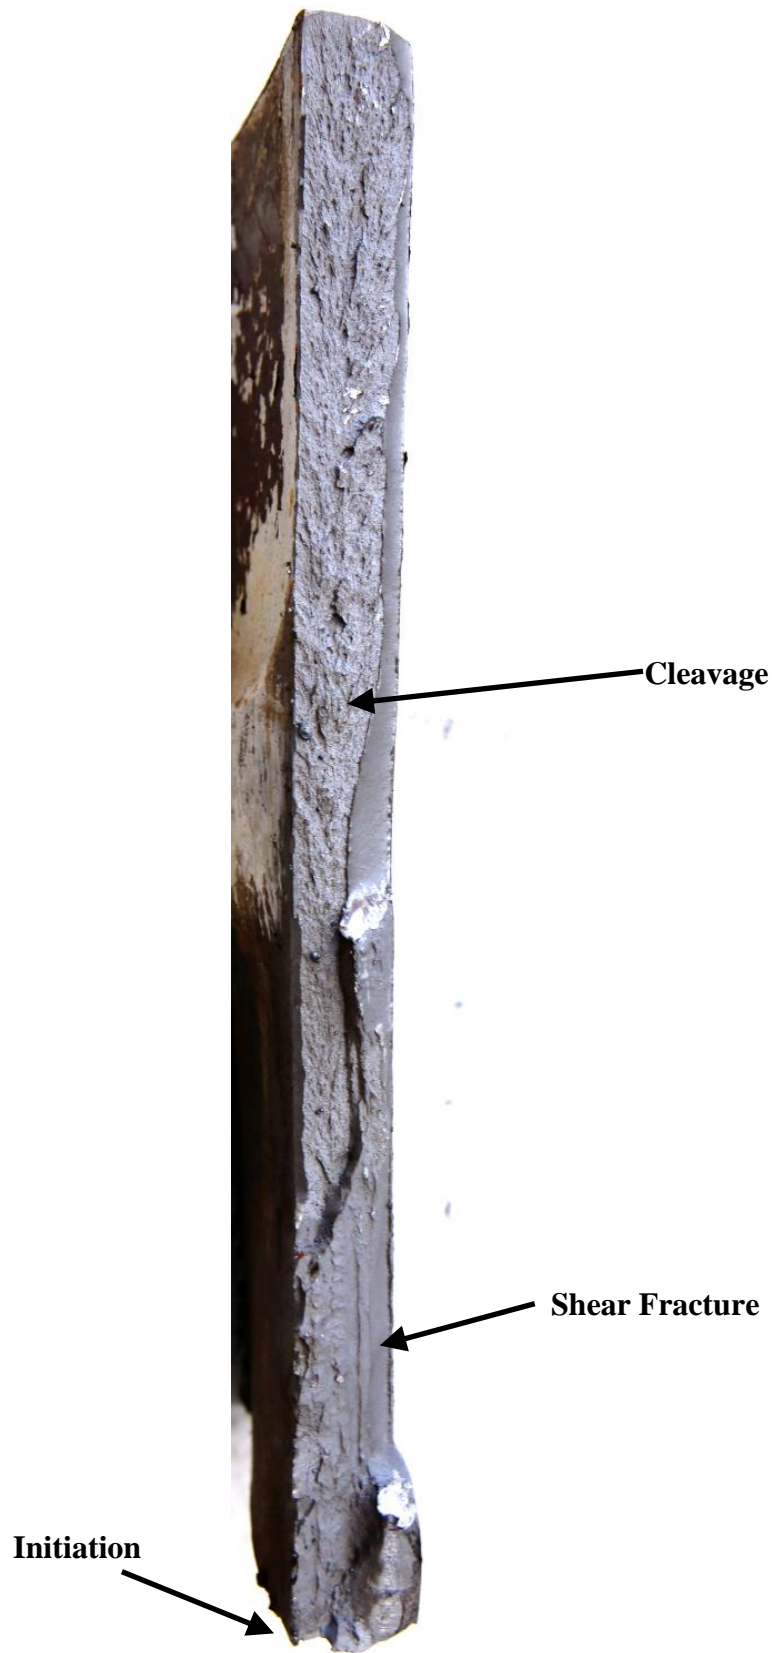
Specimen W1: East Beam Top Flange CJP Weld Fracture Surface
